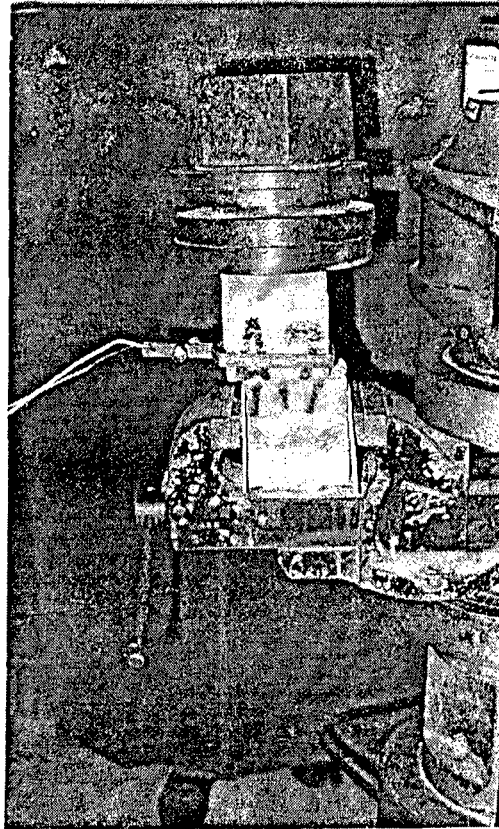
Test Setup for Brick Masonry Prism in Shear
